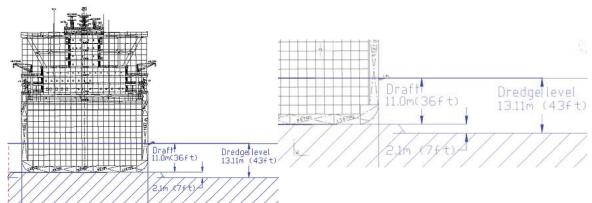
Front and mid ship draft and additional dredging depth (section view left, detailed section view right)
